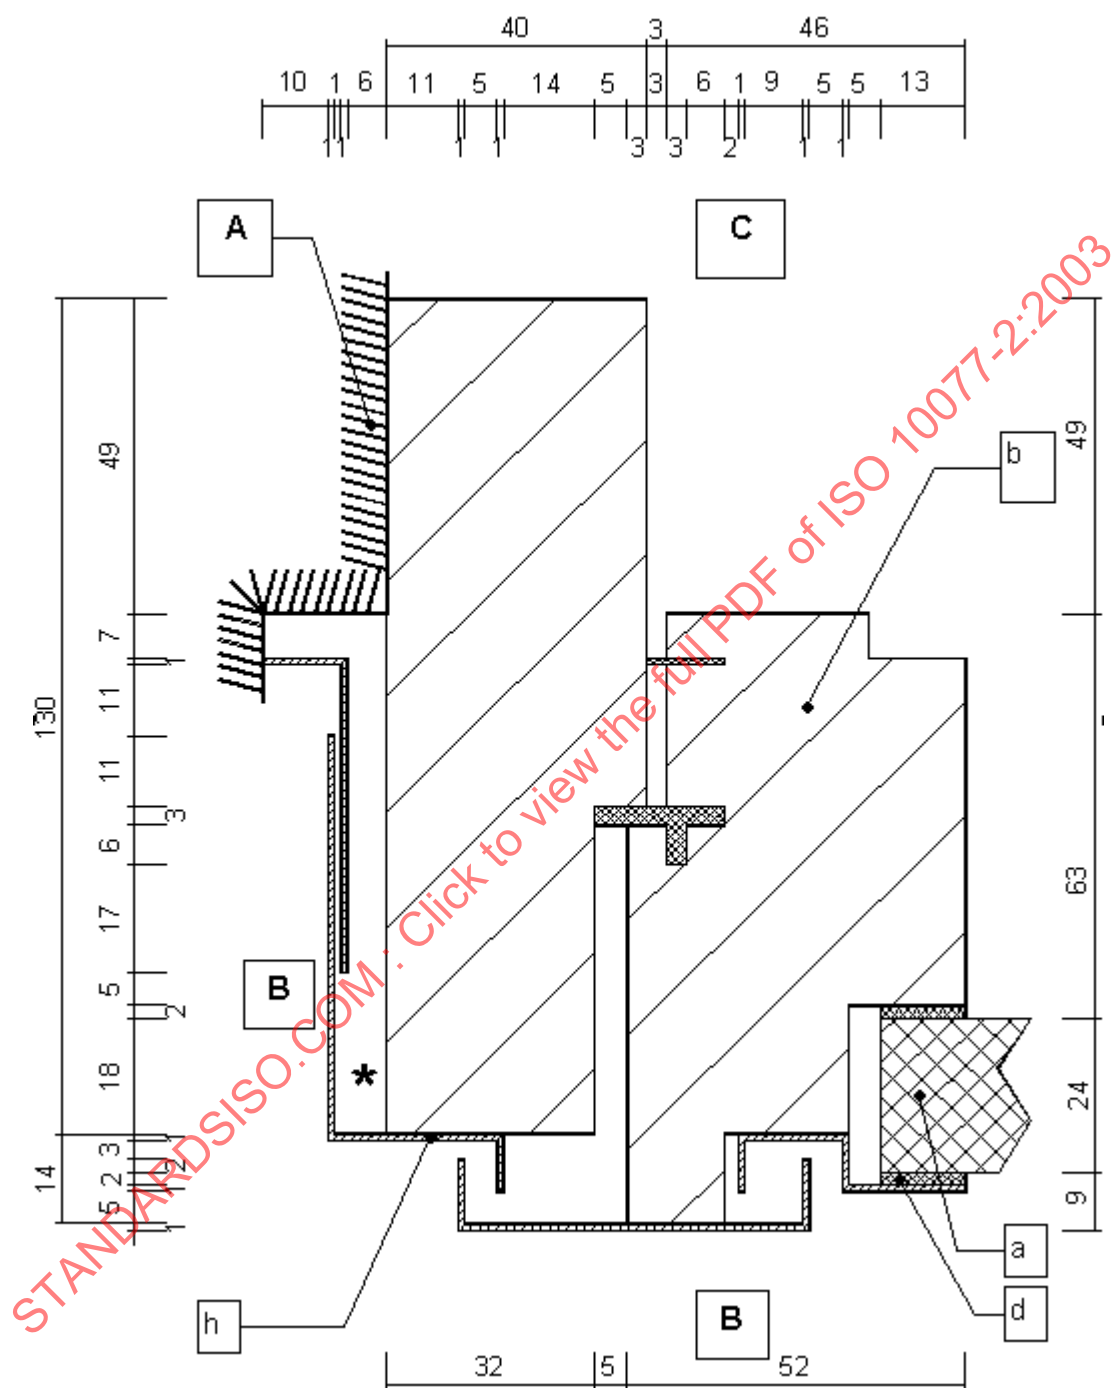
PVC-frame section with steel reinforcement and insulation panel ($b_f = 110$ mm)
